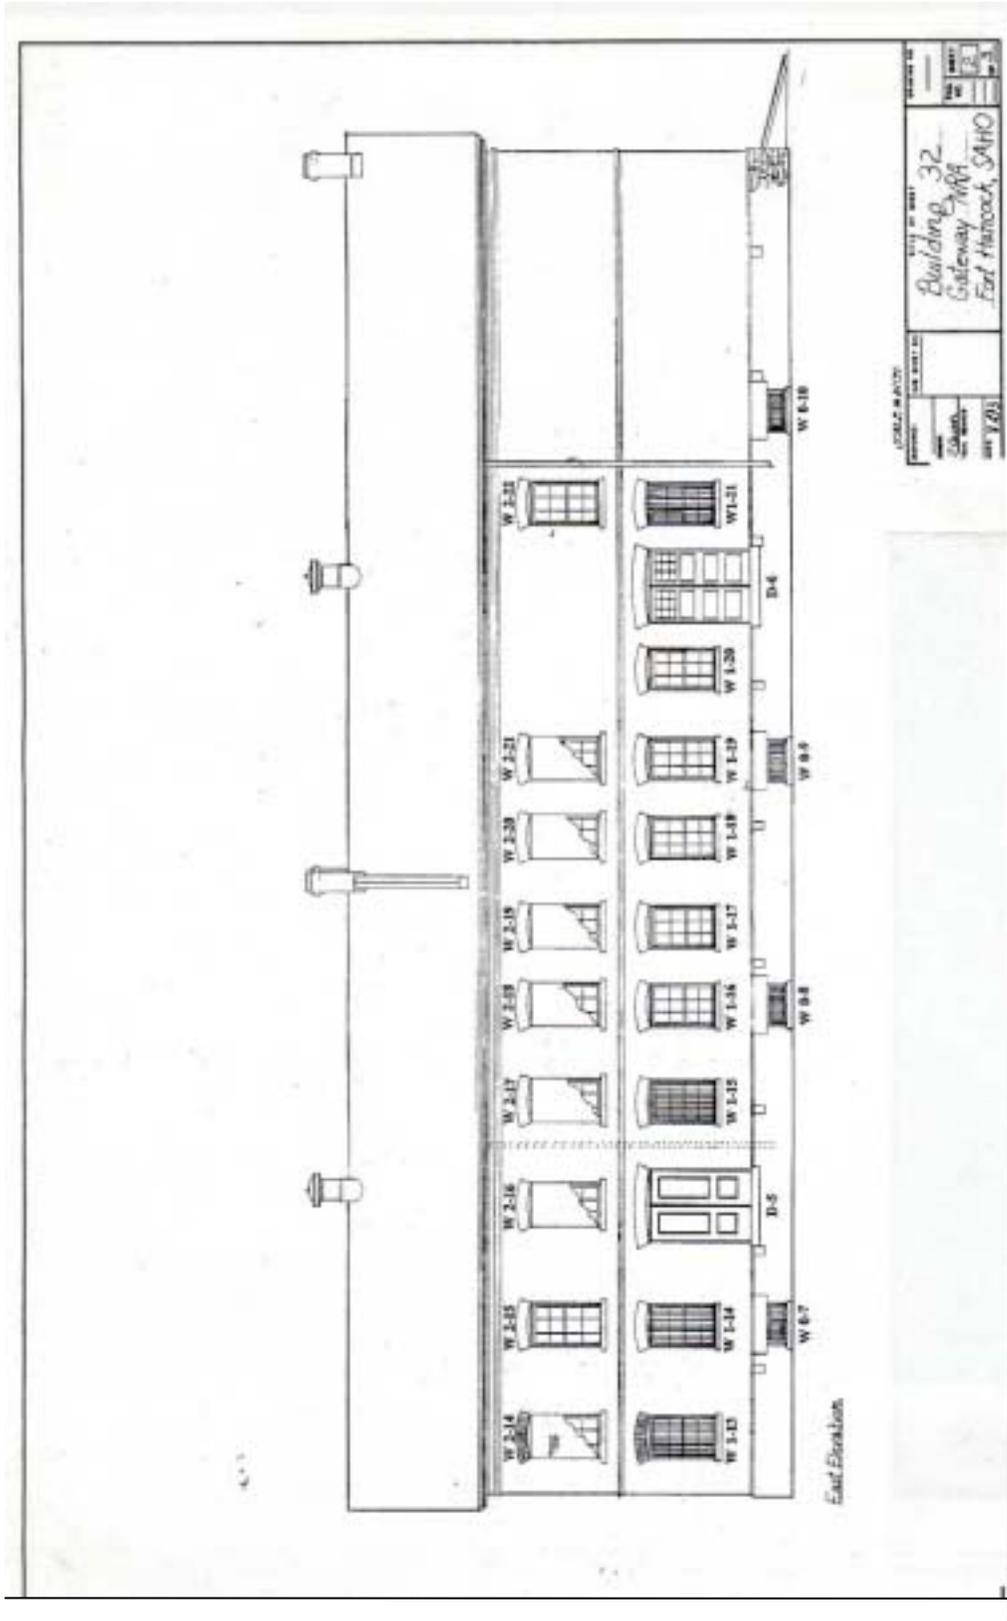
East elevation of Building 32, showing scheduled doorway and window assignments [1993].
